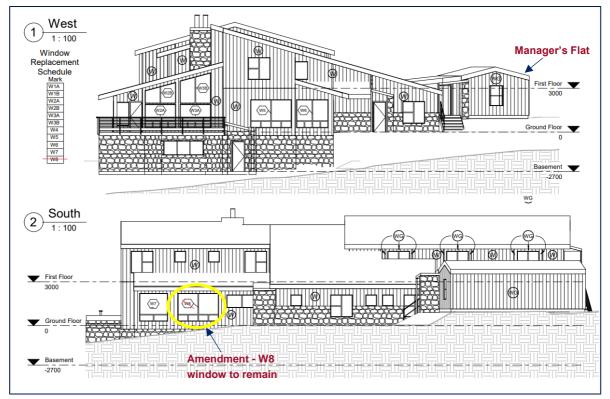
| Proposed works west and south elevations (Source: Applicant's documentation with annotations)
